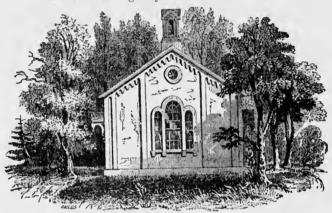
Design No. 27. - End Perspective of a School-House with Two Departments. (See Fig. 104.) This engraving represents the end elevation of a primary and secondary school
